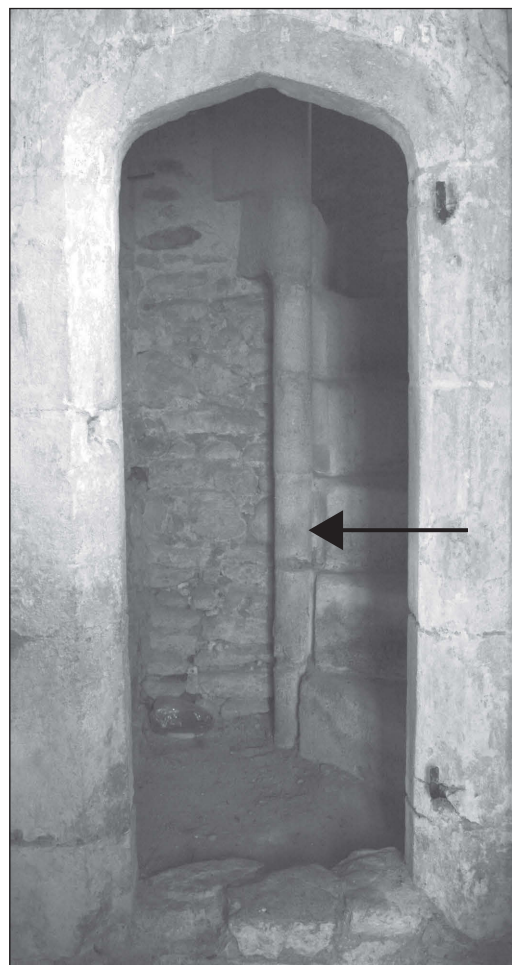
Doorway to rood stair showing notch to newel, 2014.
